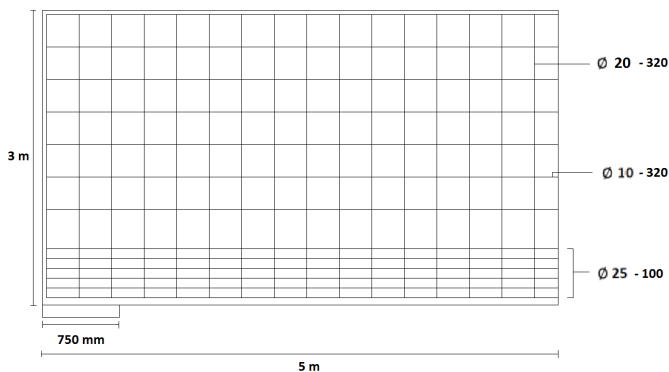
Geometry and reinforcement of half of wall girder model D1 (For model D2 additional reinforcement is applied above the supports)
